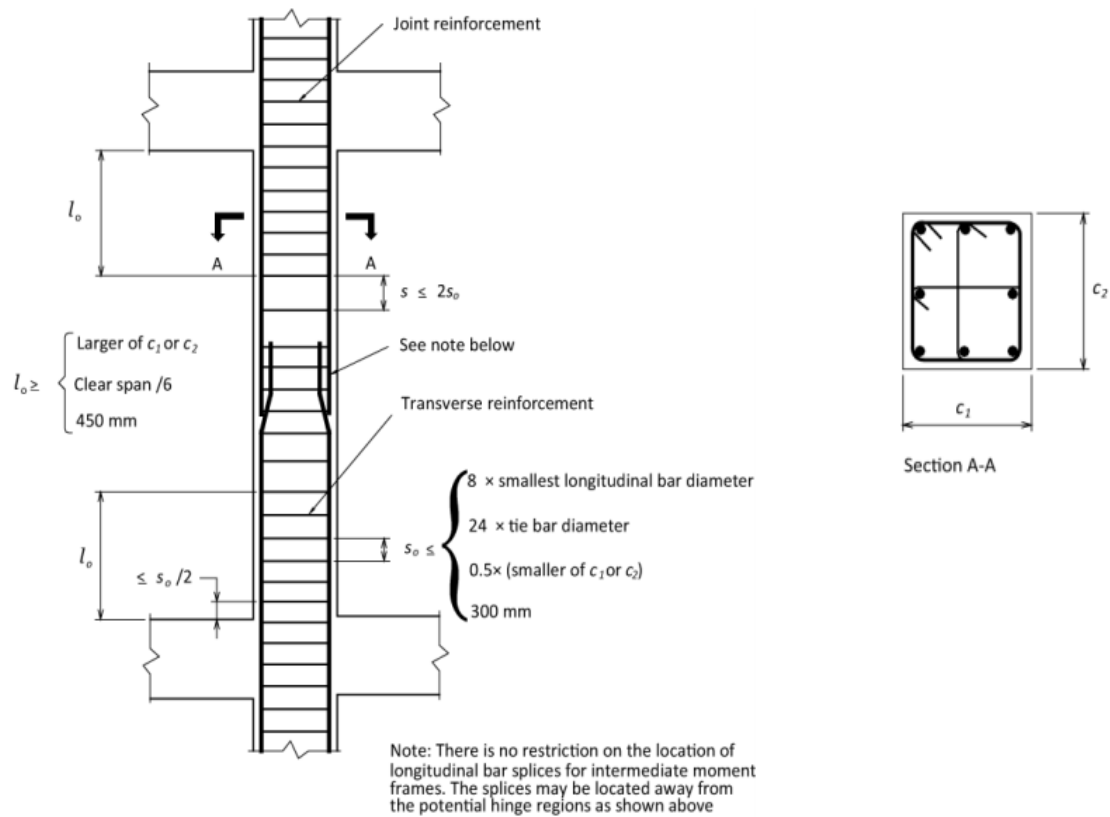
Transverse reinforcement requirements for columns (IMF) (BNBC, 2020).
